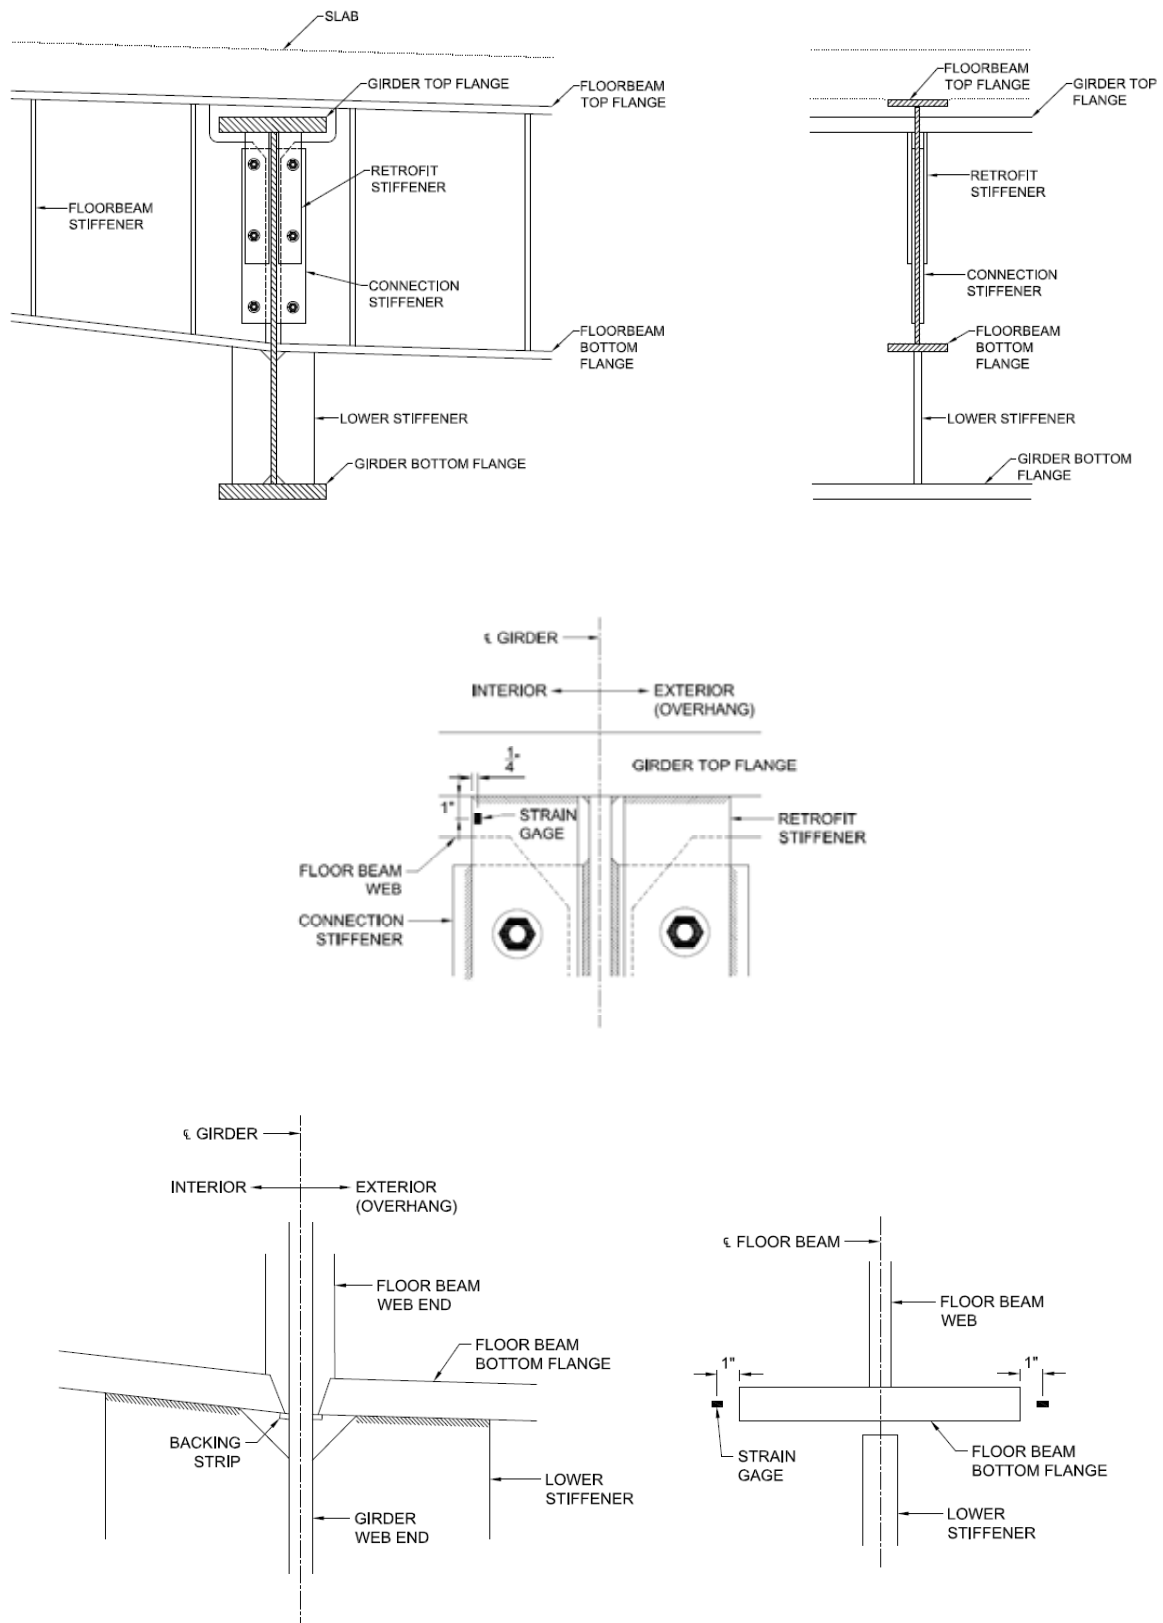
Section F17S Floor Beam 16 - Girder 1 Connection Detail and Strain Gage Locations
